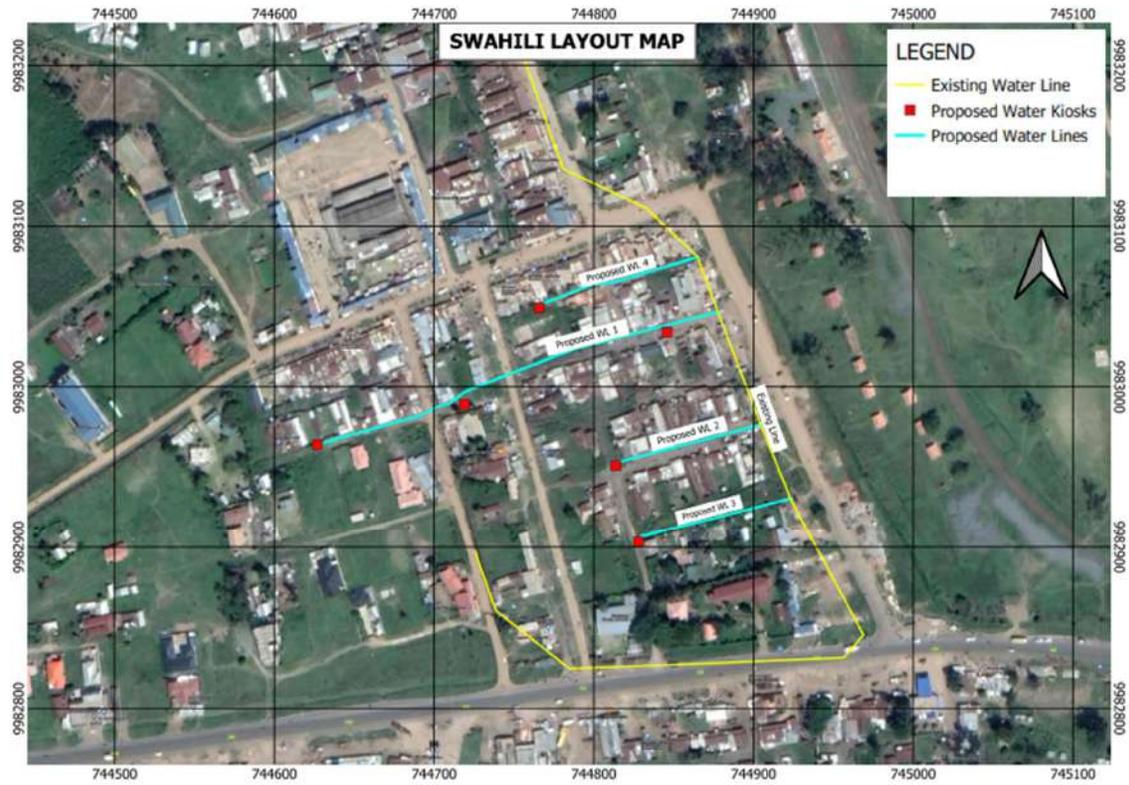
Swahili/Sangoro proposed water supply layout plan
